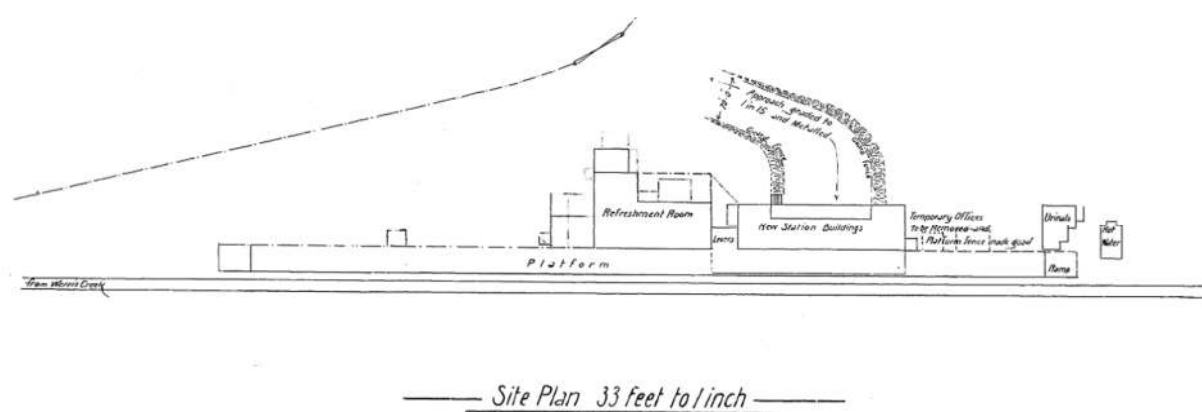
Narrabri Station Site Plan, n.d. (Source: NSW Rail Plan Room No D53/110)
